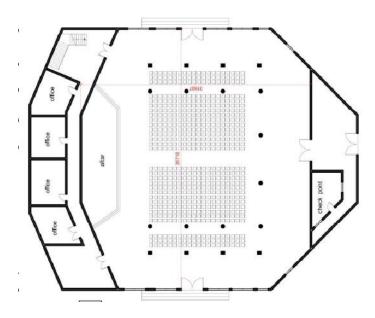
A schematic ground floor plan (with seats arrangements) of the Harvester church building
